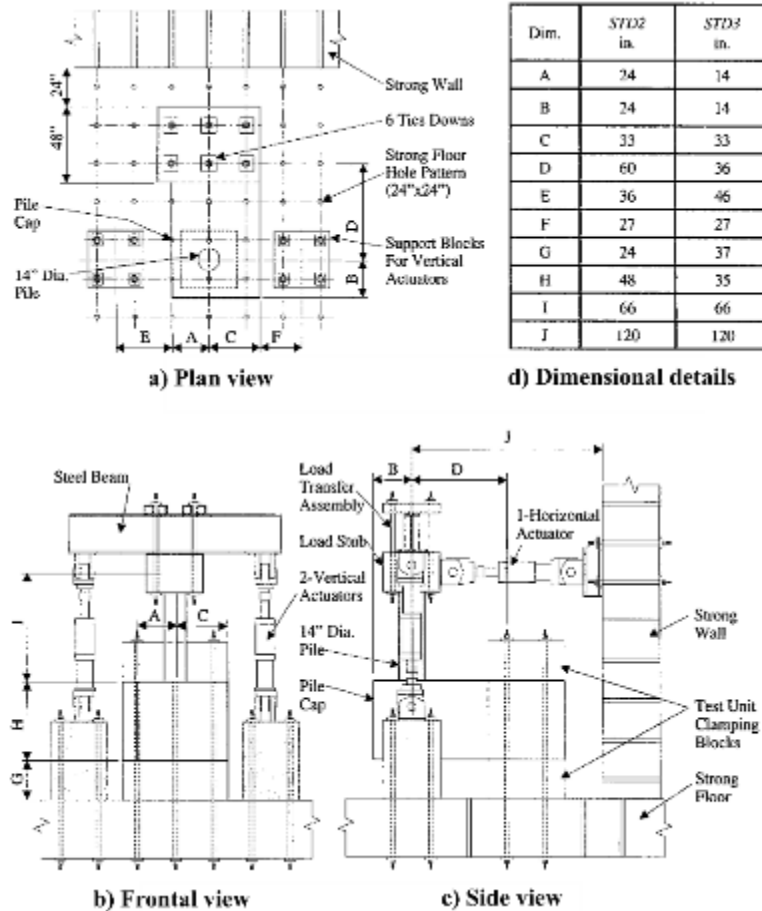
Test setup and specimen details, (Silva & Seible, 2001)
